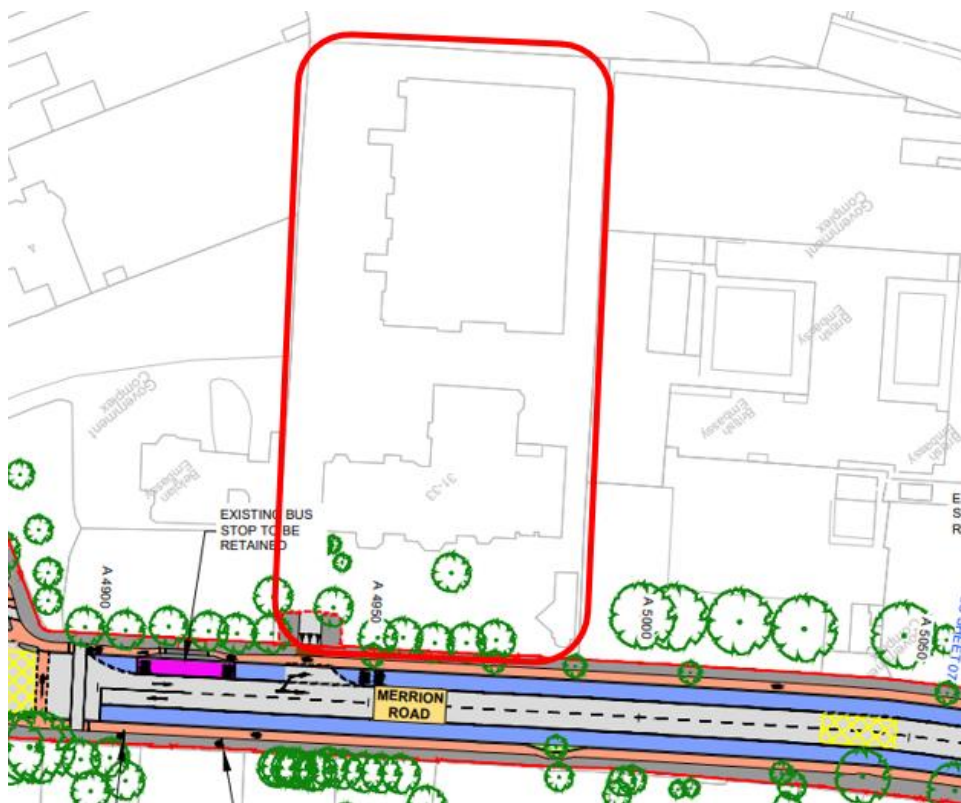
Proposed new Layout at 31-33 Merrion Road
